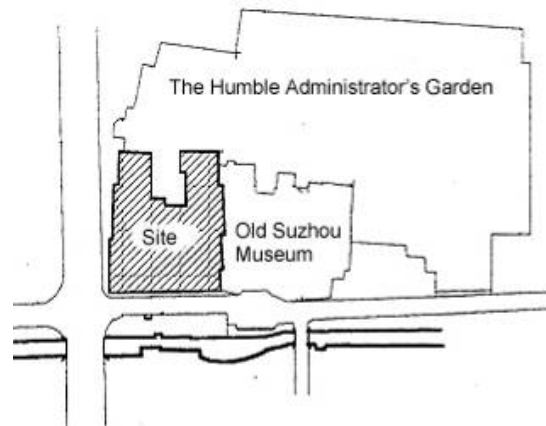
Site of The Humble Administrator's Garden with adjoining site of the existing old and proposed New Suzhou Museum.
